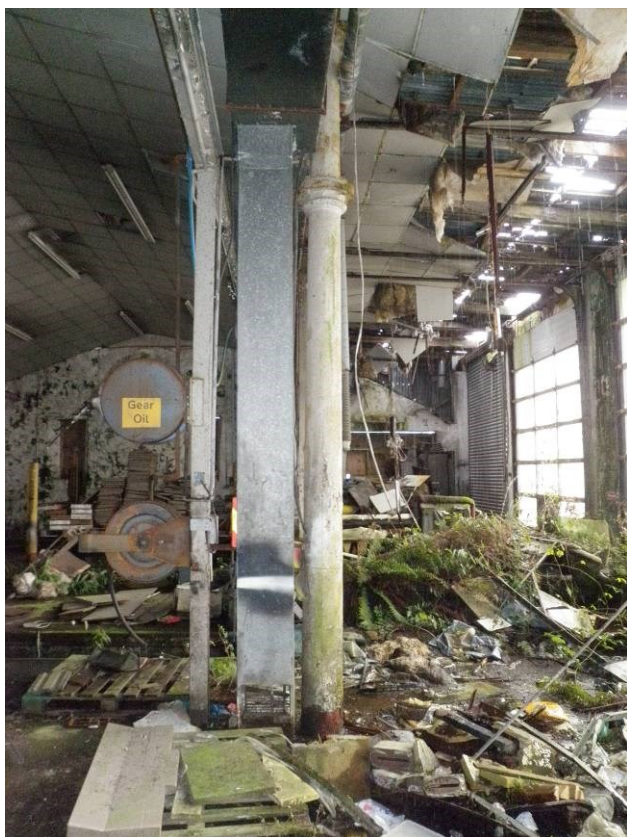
Building 5 interior looking south at cast-iron pillar between main building and lean-to
